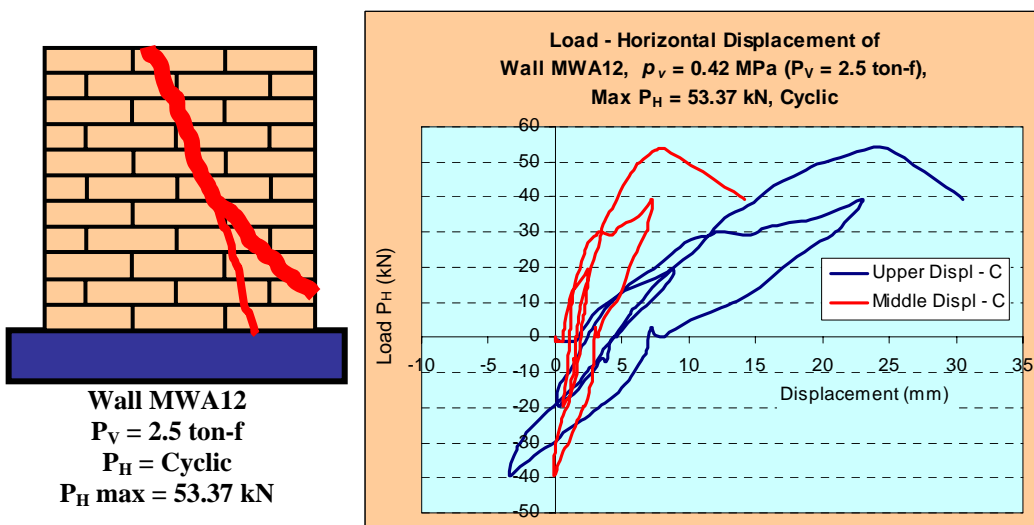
Failure pattern and load-displacement of wall MWA12
